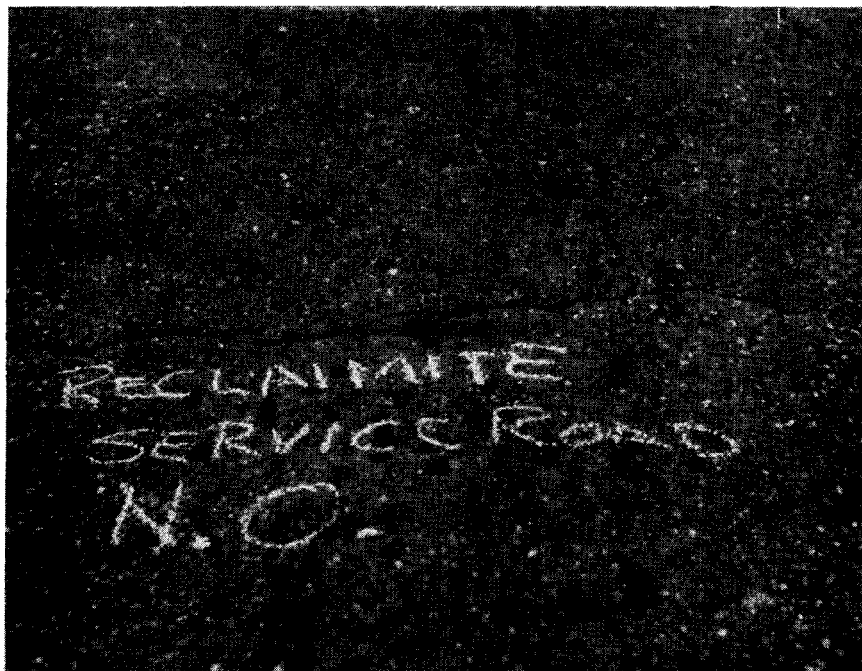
RS-3K Treated Crack on New Orleans Service Road During February 1969
